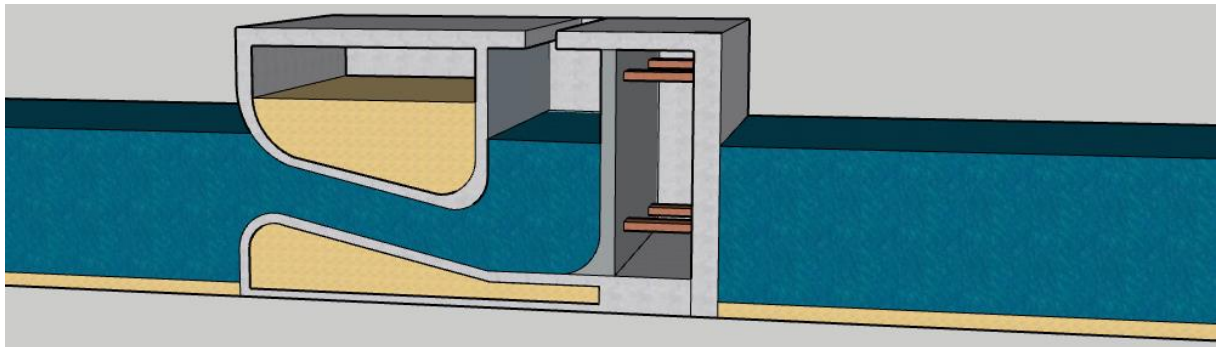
Design drawing of the Ocean Falls – Isometric view - SketchUp Pro 2019
